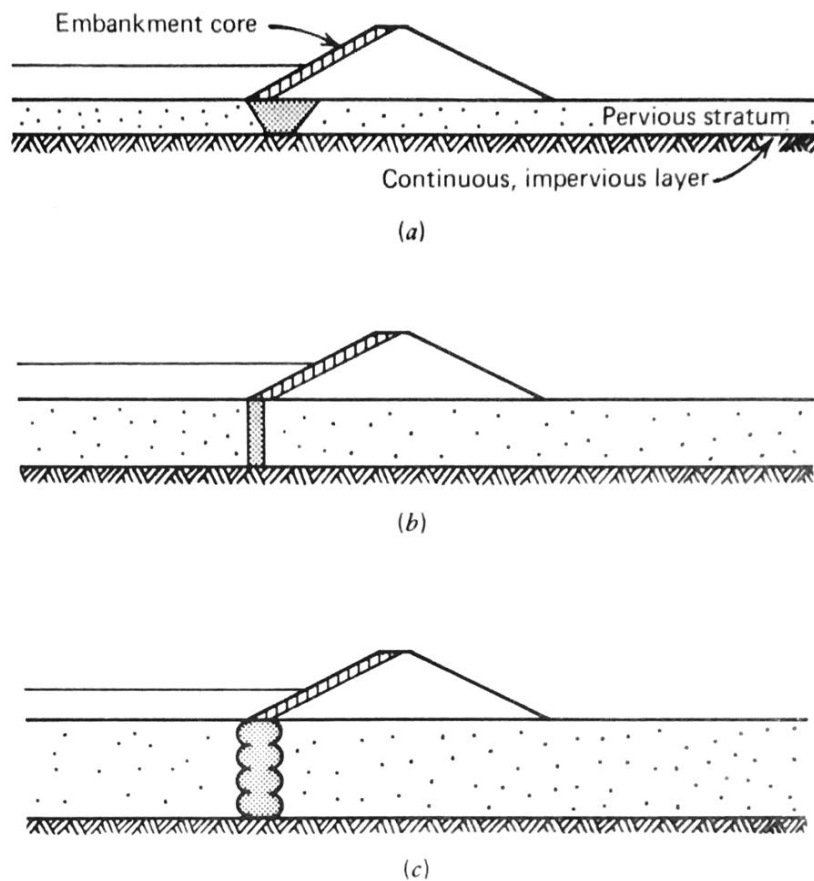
Seepage barriers (a) Cutoff trench, (b) Slurry walls, (c) Grout curtains (Vick, 1983).
